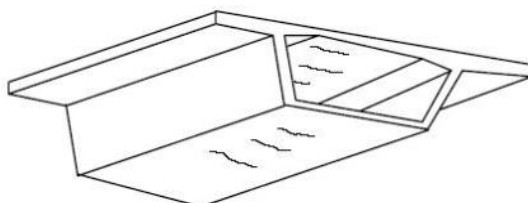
Temperature Cracks Thermally Induced Cracks in Box Girder
